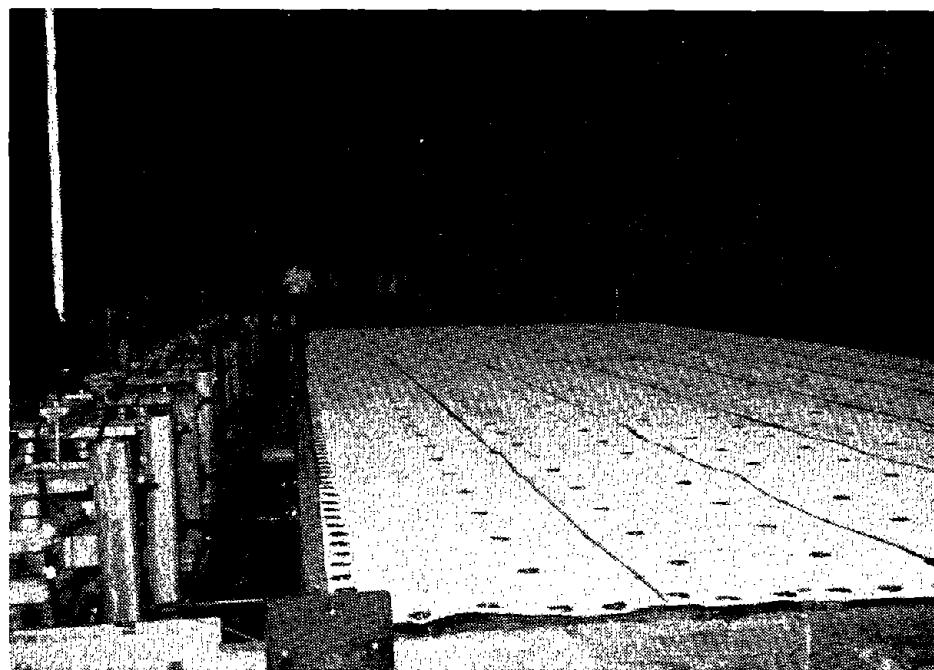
DIAPHRAGM I SHOWING SMALL BUCKLING WAVES IN ROOFING.
